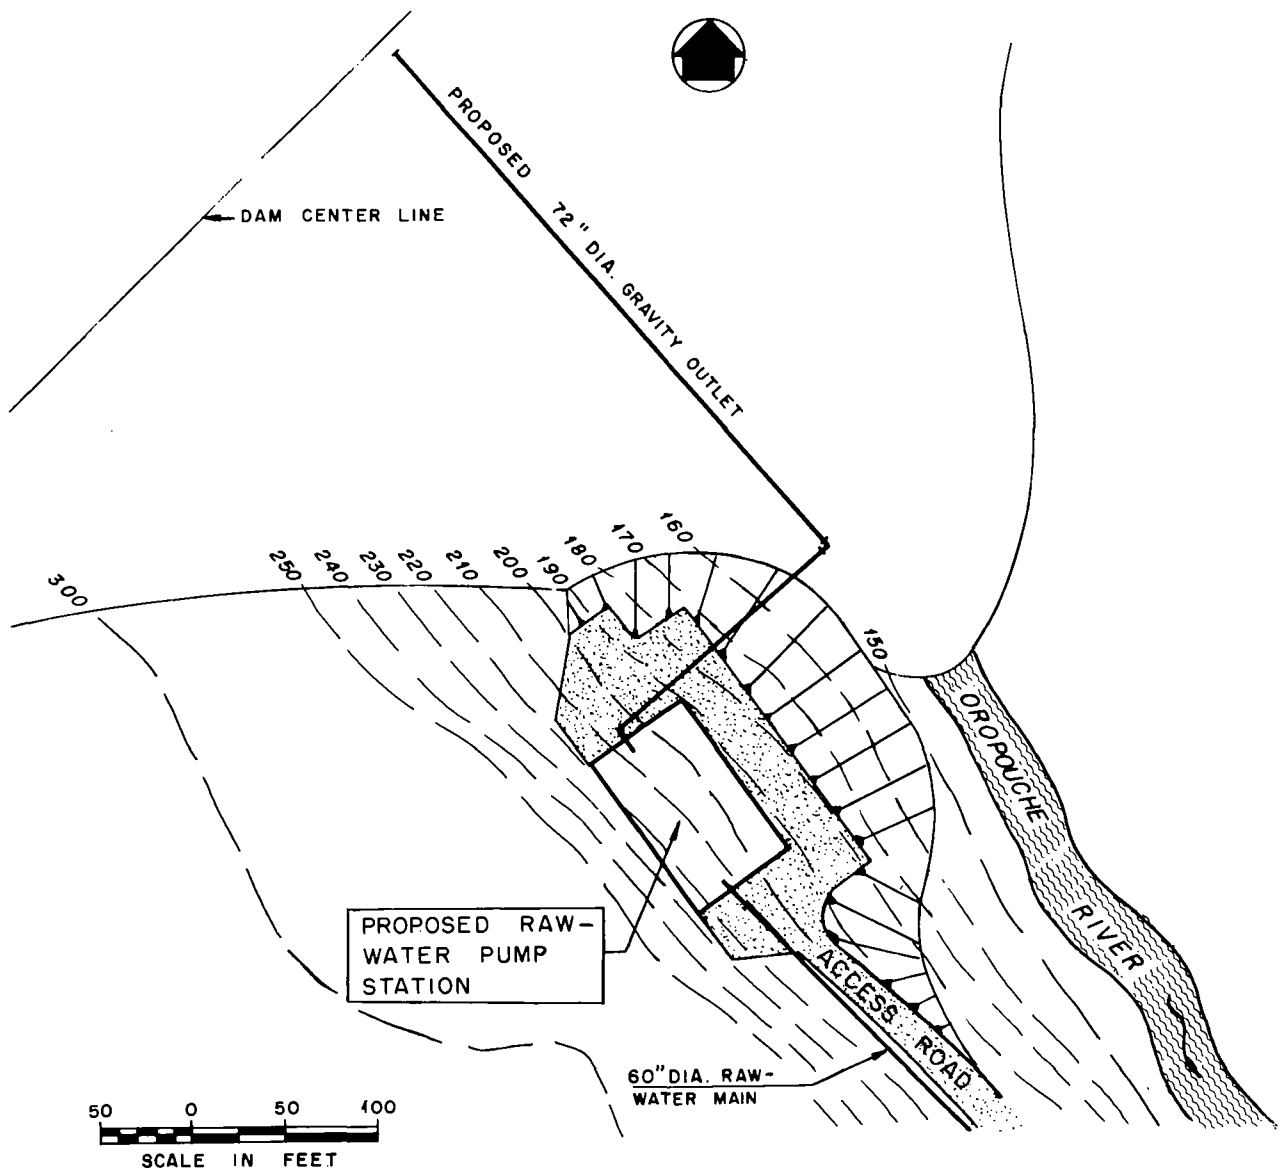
OROPOUCHE RAW-WATER PUMP STATION – SITE PLAN
